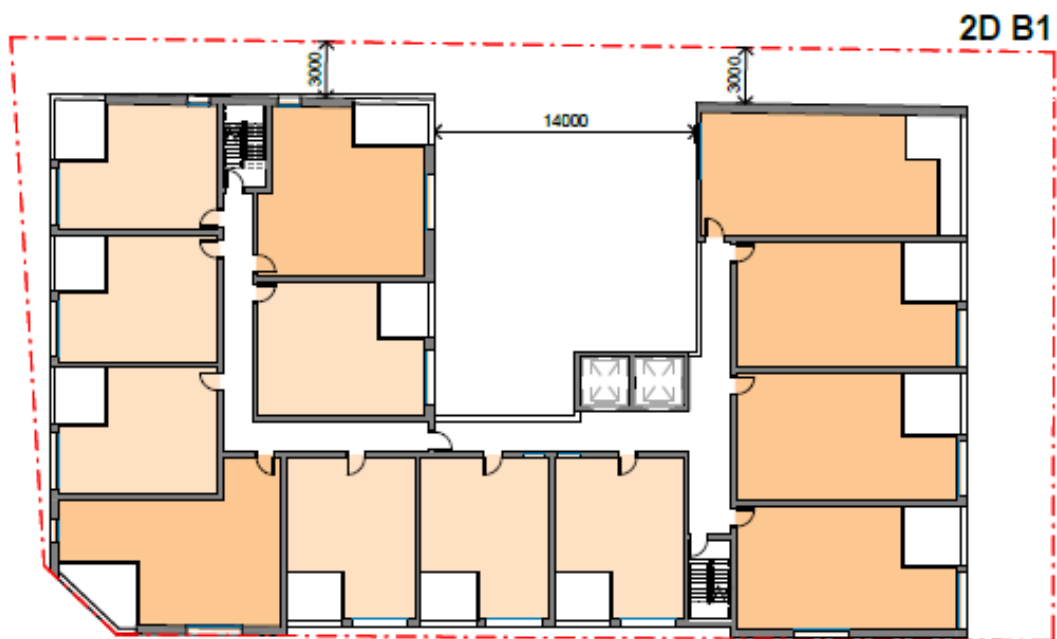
Building 2D Reference Scheme Typical Lower Plan
